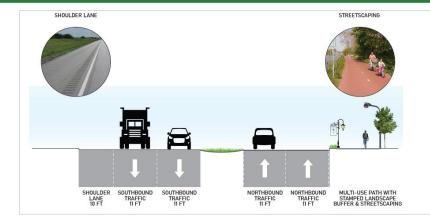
Segment A: Proposed Typical Section (Grange Road to Smith Avenue)
